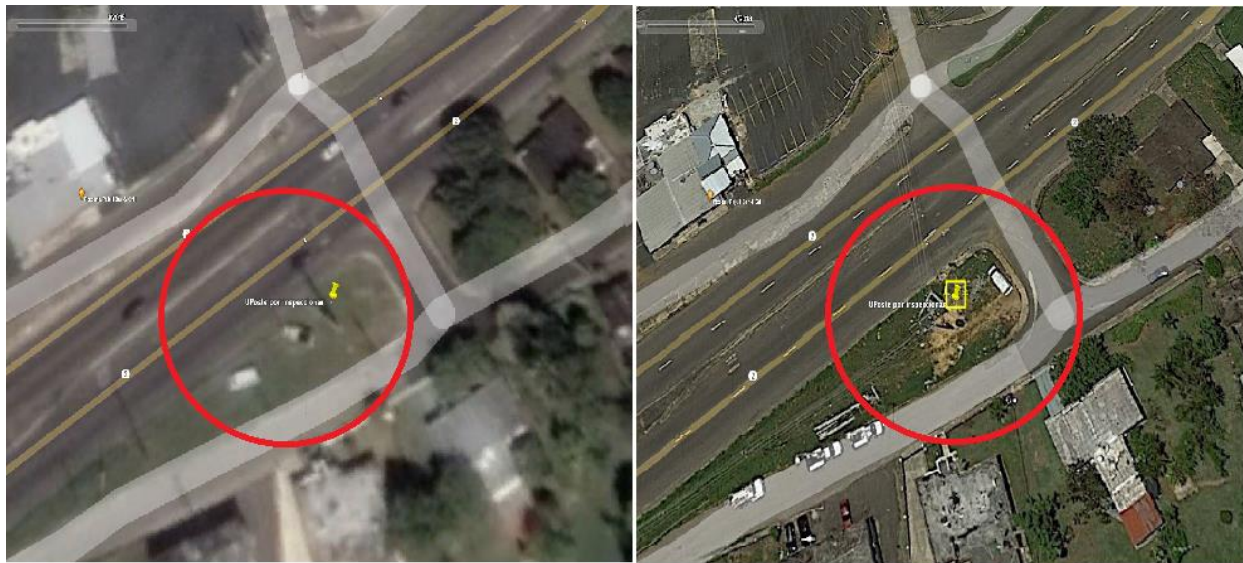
Photo of Cantilever Sign Soil and Structural Foundation Failure at P- 69 Location: 18° 29'18.024"N; 66°48'0.72"W (Photo 1 date: 1/2015, Photo 2 date: 4/2018)
